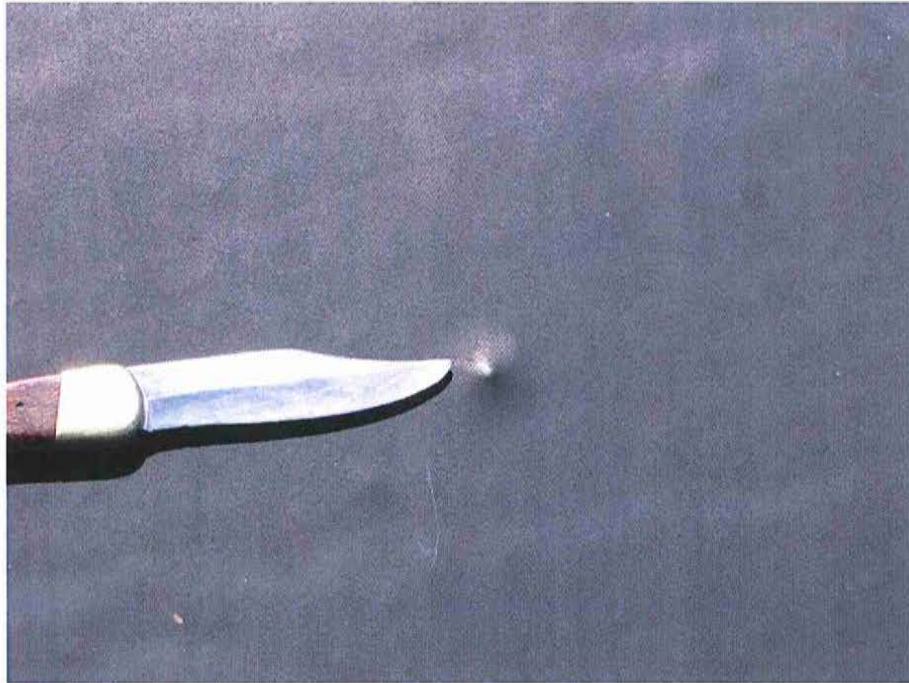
Intermediate Pump Station - Roof membrane with fastener below backing out and up into membrane. This will lead to a hole in the membrane.
